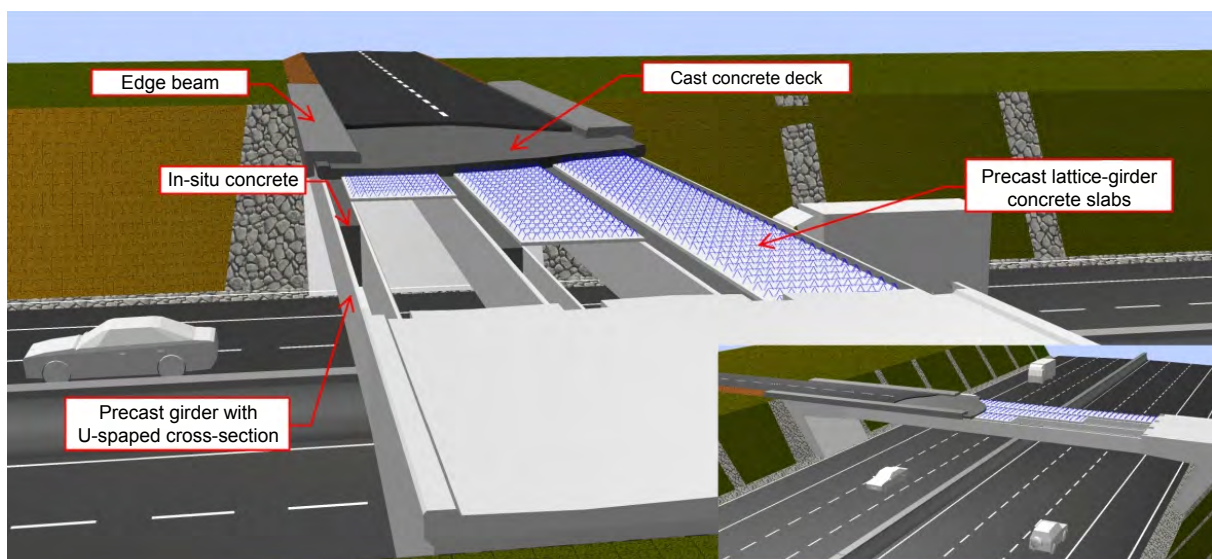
Design-scheme of a motorway overpass erected using lightweight precast concrete girders and prefabricated slab elements (Wimmer (2016))
